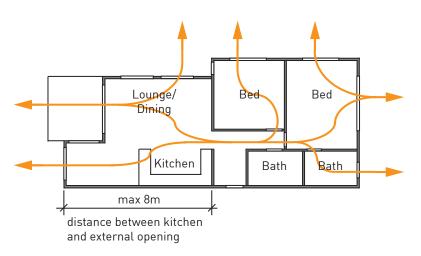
C.16-1: Building layout that facilitates cross ventilation.
